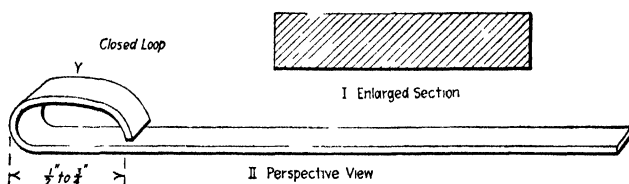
Loop formed in end of steel ribbon wire used for fishing conduit.
